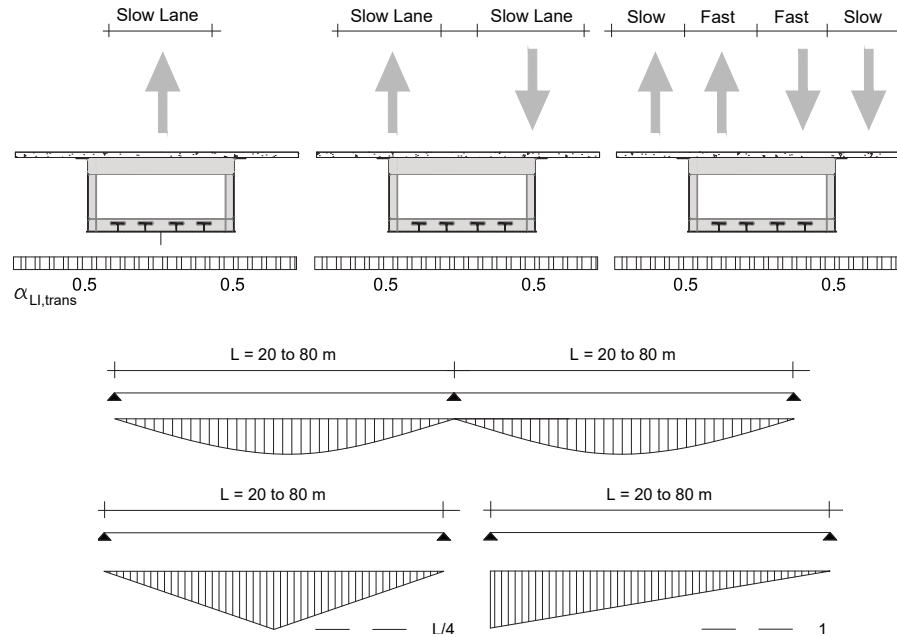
Transversal traffic arrangement and longitudinal structural systems
